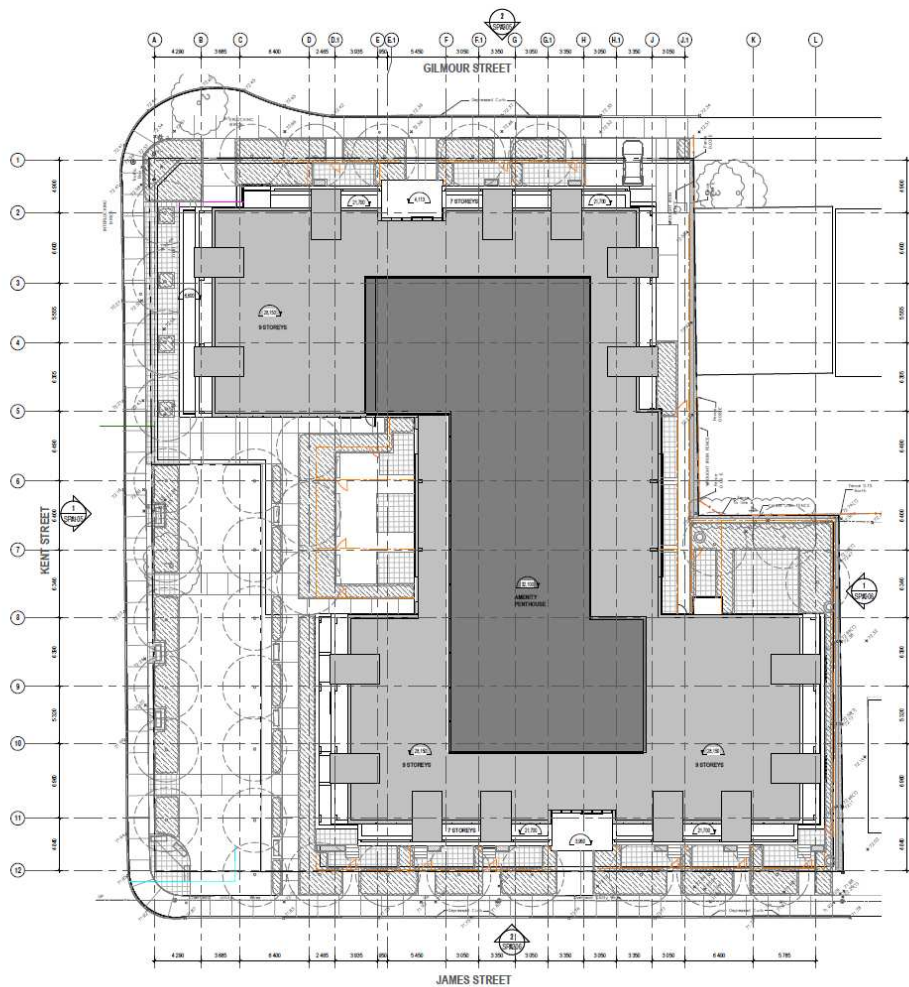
Propose Site Plan. Building design by 'NEUF ARCHITECT(E)S'.
